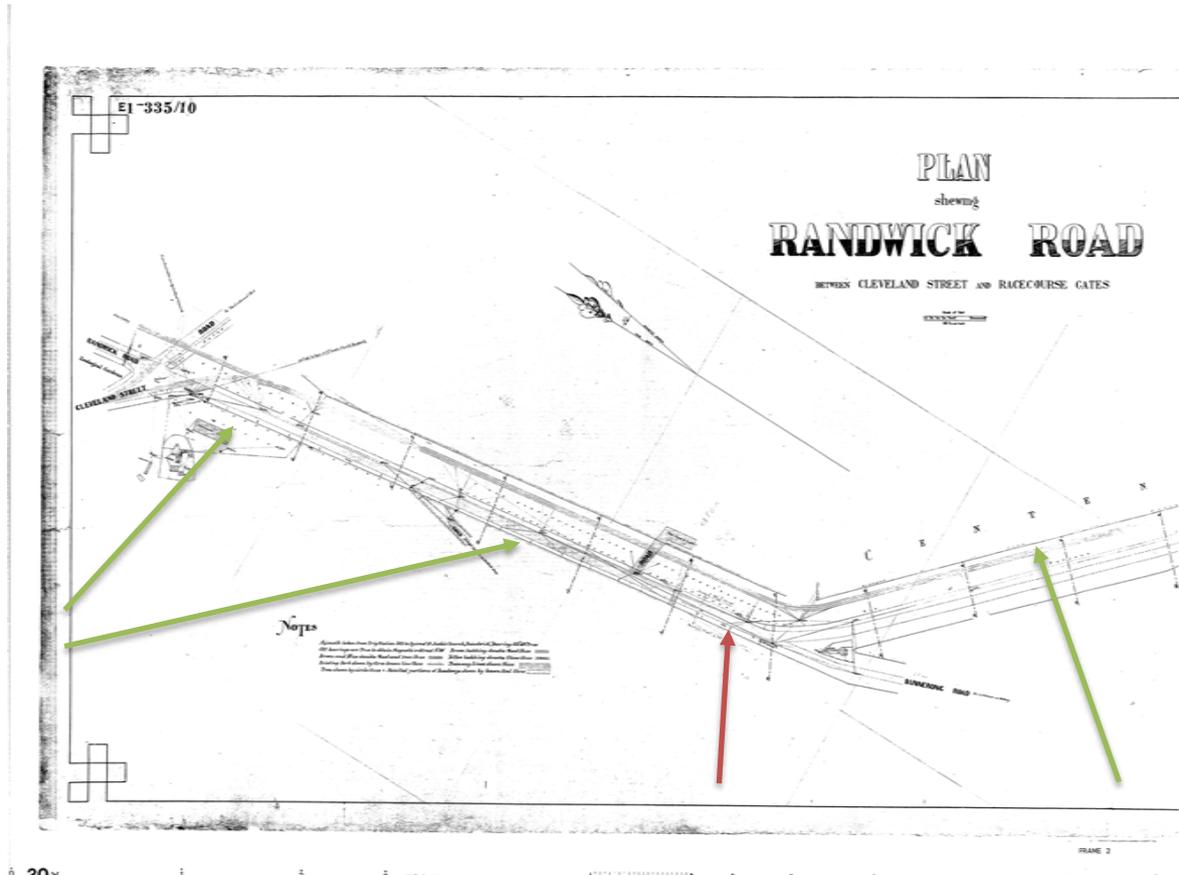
| This undated plan of the route between Cleveland Street and the Randwick Racecourse Gates shows the plantings and design ambitions for the road. The green arrows point to an avenue of trees to the north and a line of poplars on the south. The red arrow points to a toll house. The tram tracks are on the northern side of the road. The road was constructed from wood and iron and stone – all of which are indicated by shading in the original colour version of the plan. [SCCA: E1-335/10.2].
